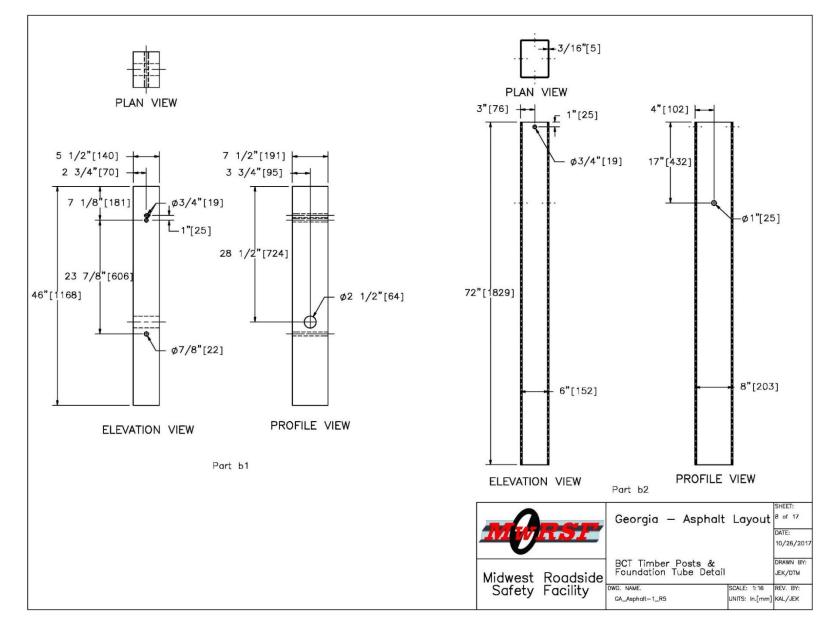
BCT Timber Posts and Foundation Tube Details, Test No. GAA-1
